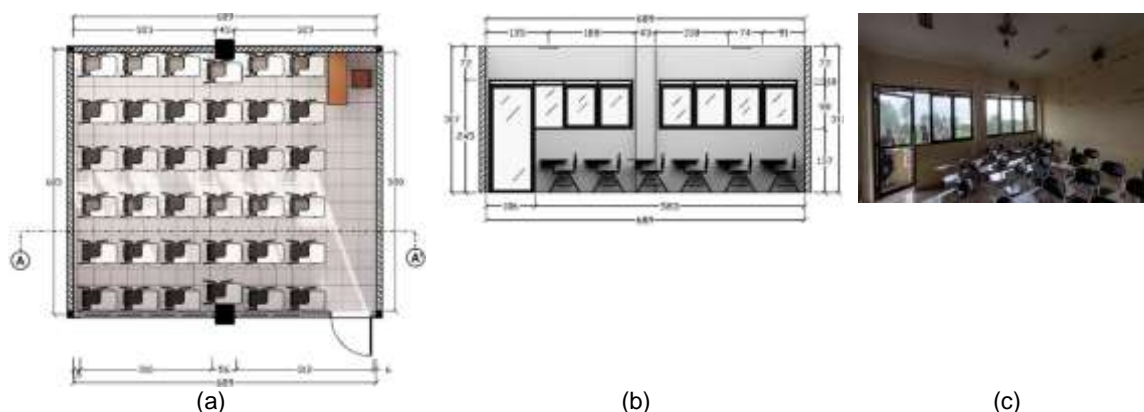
X Nursing 1 Classroom (a) Layout, (b) Section A-A', and (c) South Side View
